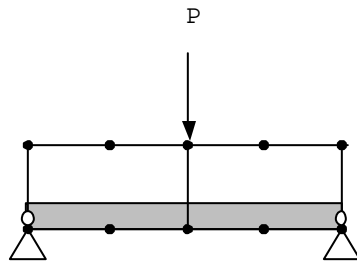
Illustration of 1-Span Bridge Chord, Rods are Hinge Elements, 1-Point Load Beam Model
